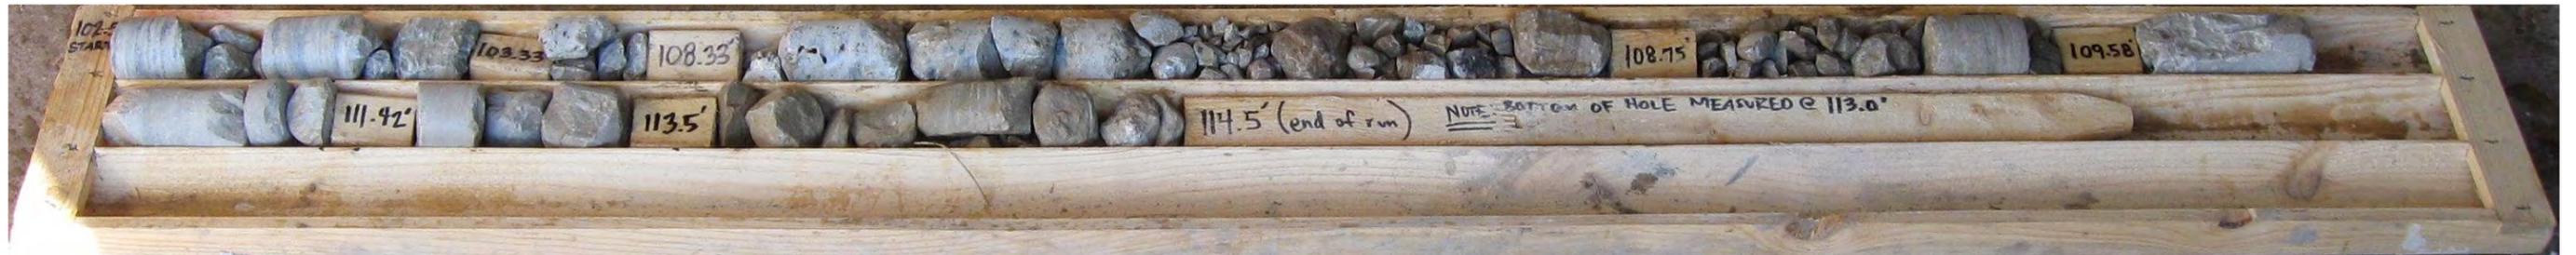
Borehole No. 107 – Rock Core. Elevation 155.17 metres to 150.95 metres.
